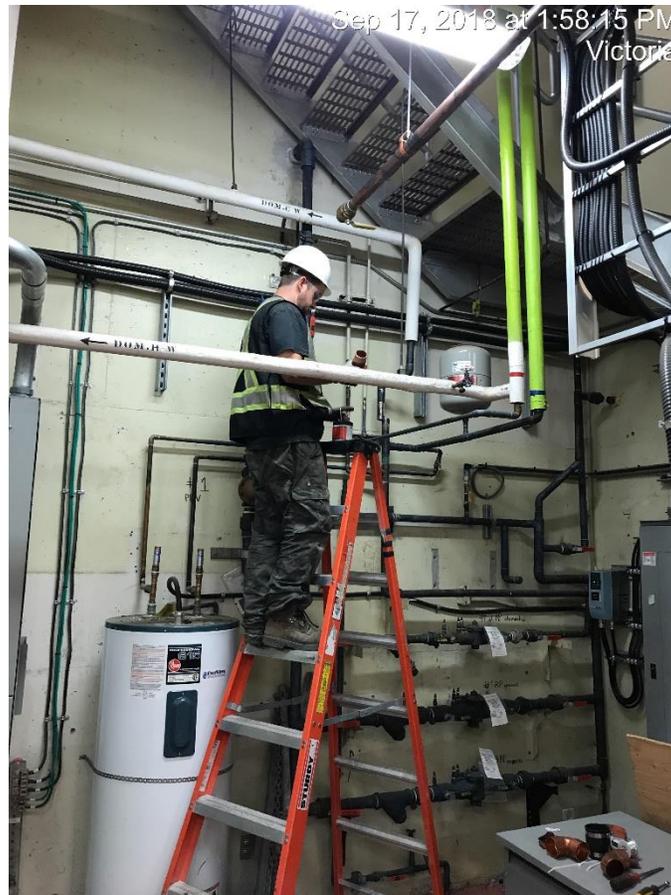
Macaulay Point Pump Station: Installing temporary water service tie-in to existing pump station.
